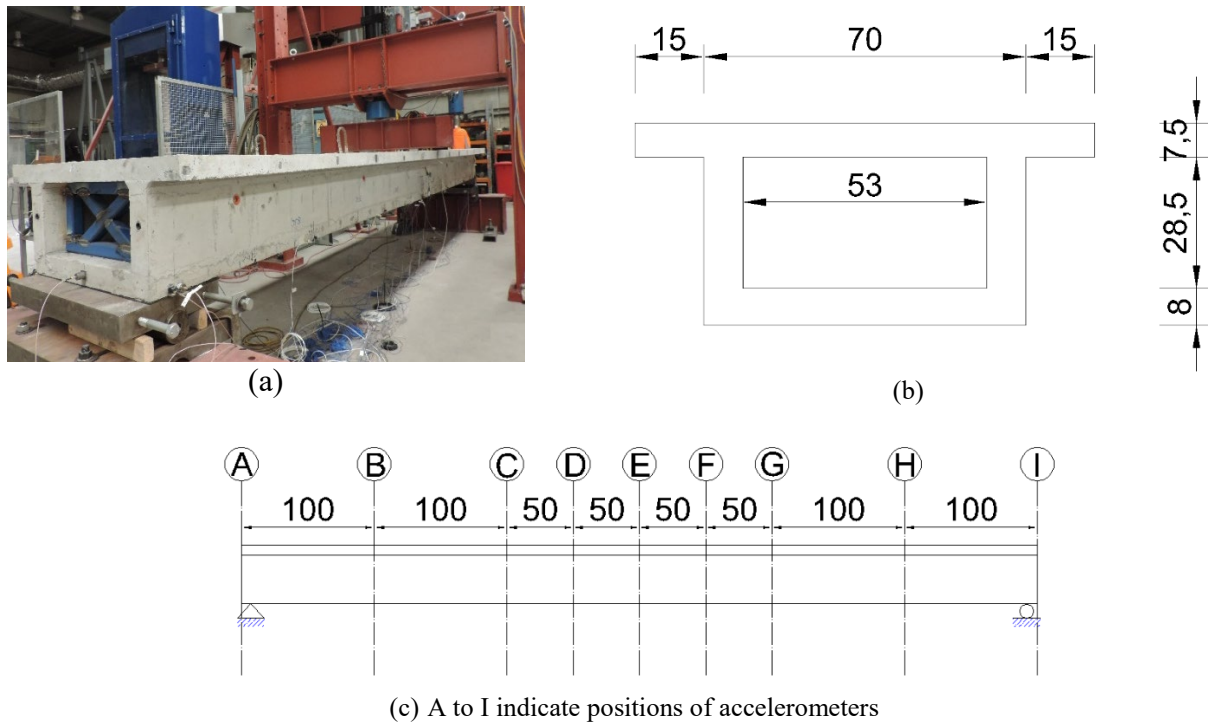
The box-girder model (a) test setup, (b) cross-section, (c) detailed dimensions (all dimensions are in cm).
